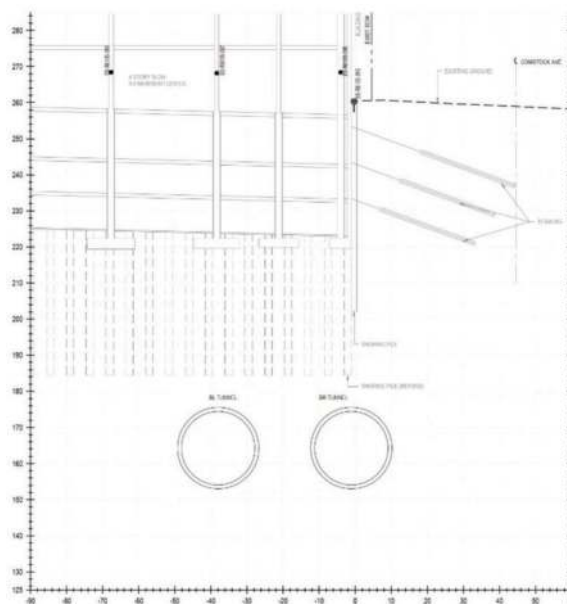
Section showing Metro tunnels beneath deep SOE piles (design).
